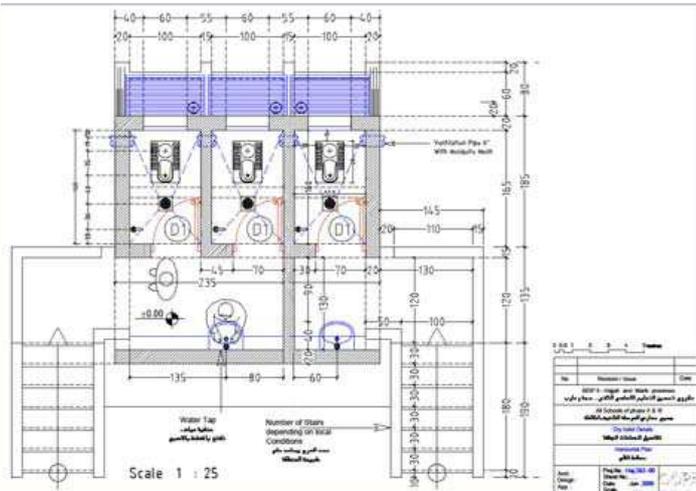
Drawing (plan view) of UDDT block with three cubicles (GOPA, 2007)
